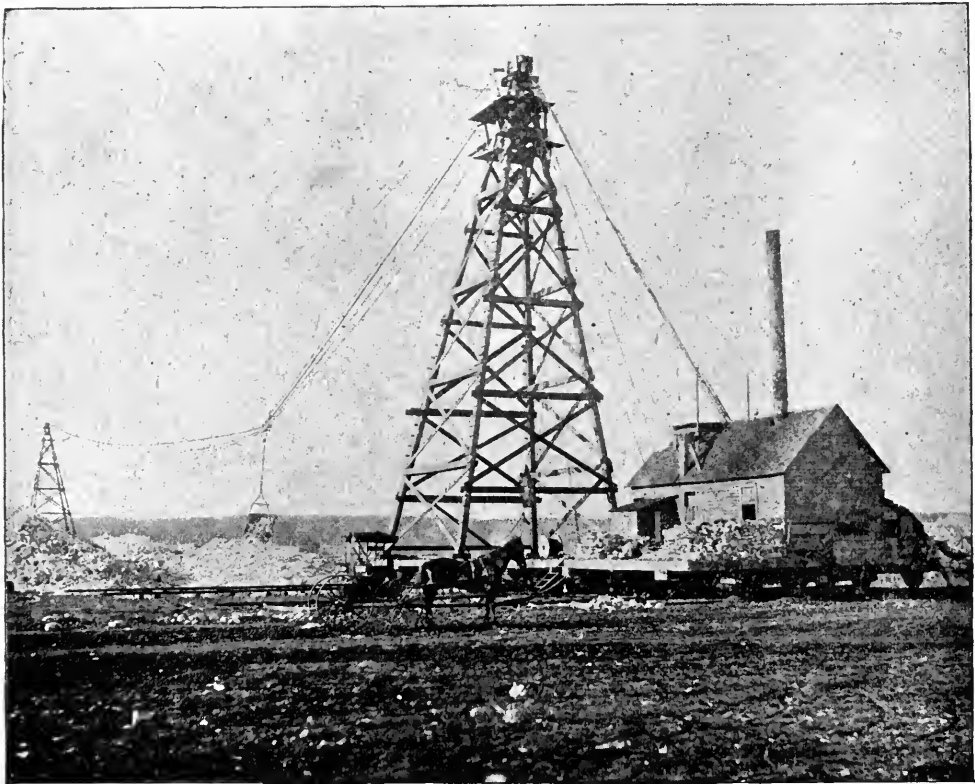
Head Tower Lidgerwood Traveling Cableway.
